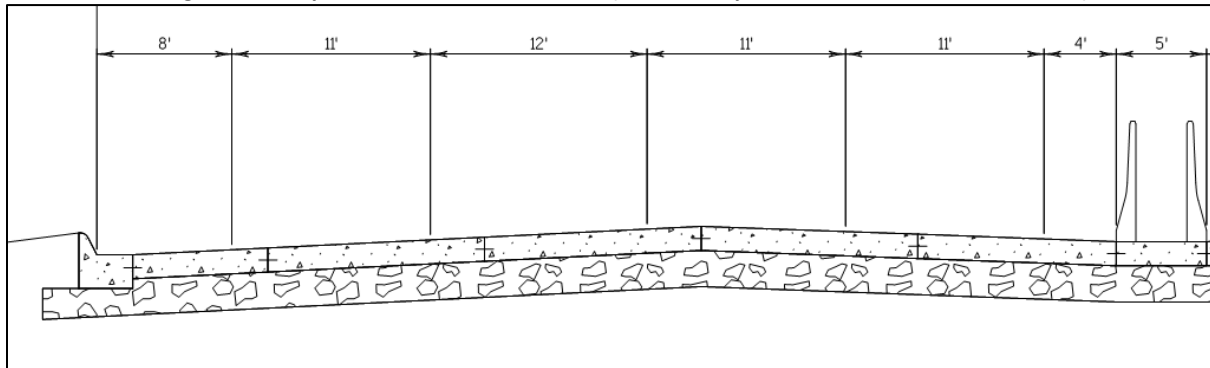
Proposed I-43/94 Cross Section C (between Lapham Boulevard and Becher Street)
